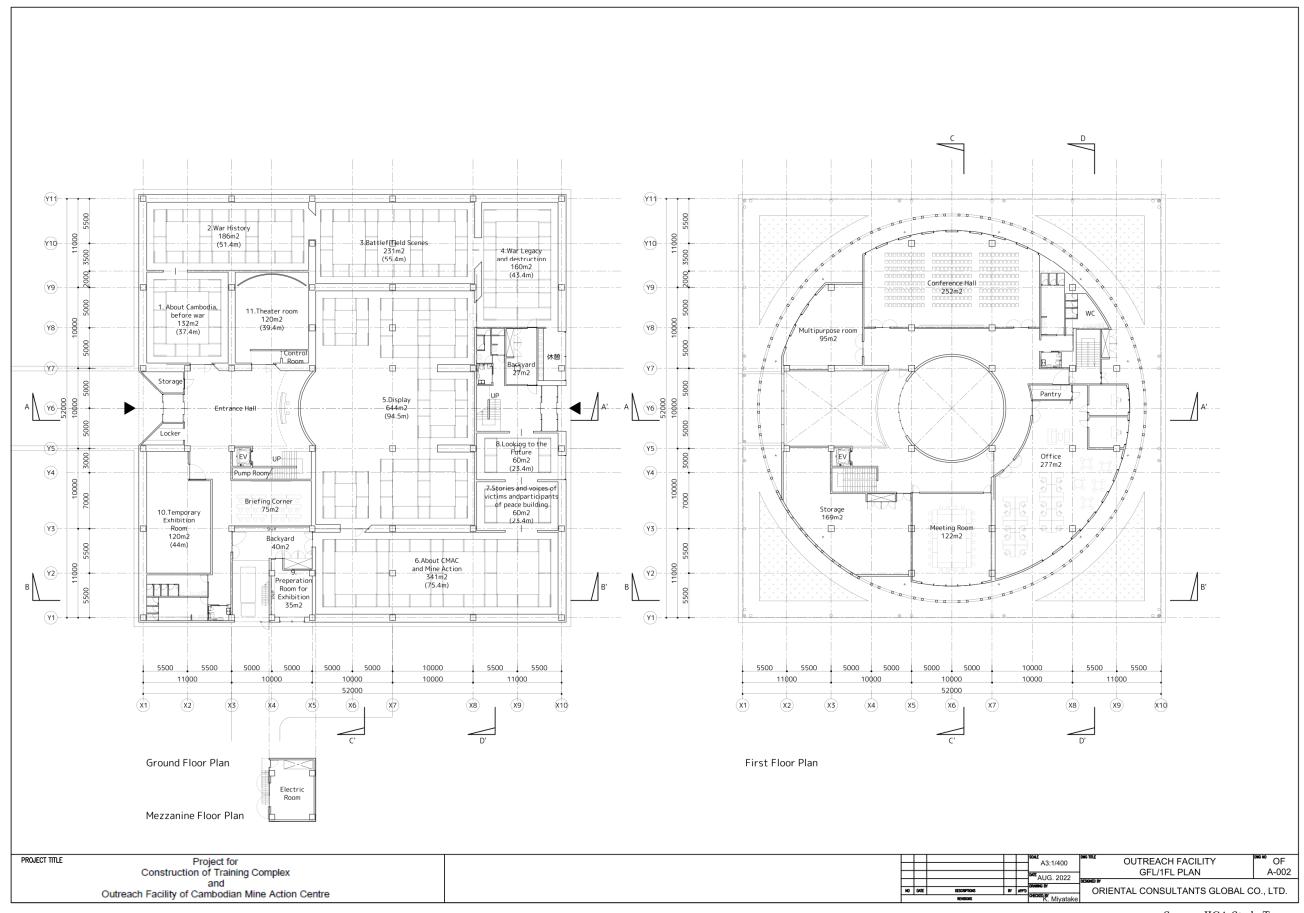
Floor Plan of OF (GFL, 1FL)
